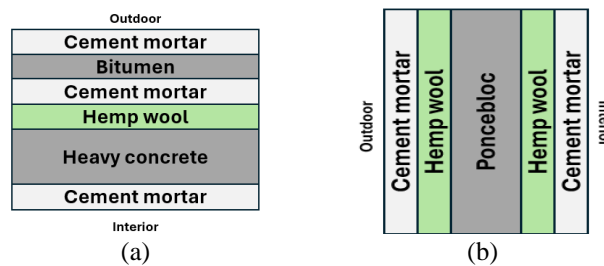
Suggested configuration in roof and external wall (a) roof configuration and (b) external wall configuration
